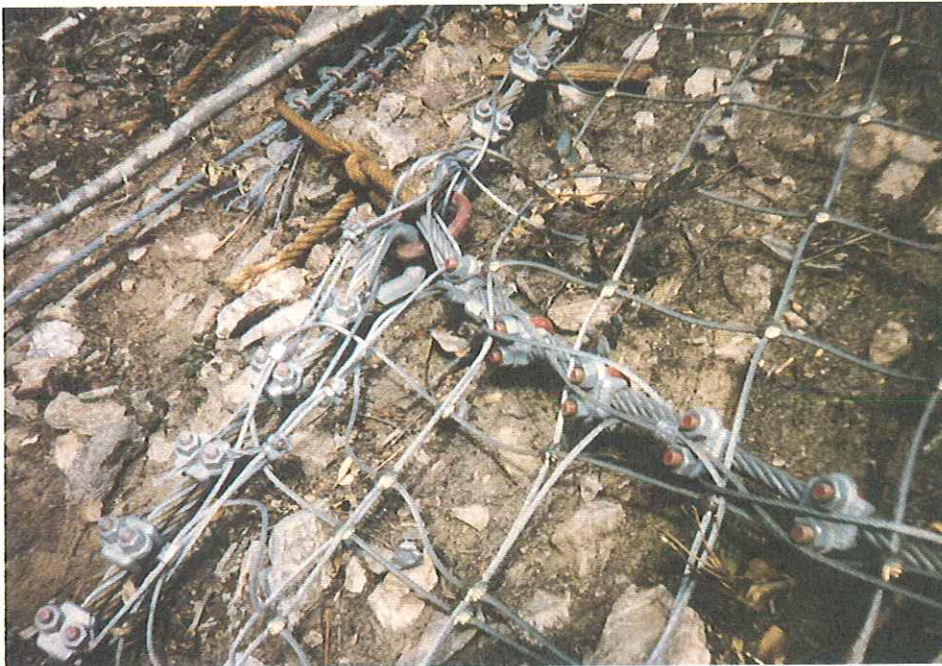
Brugg cable net installed and tied to wire rope (*Courtesy Washington Department of Transportation*).
